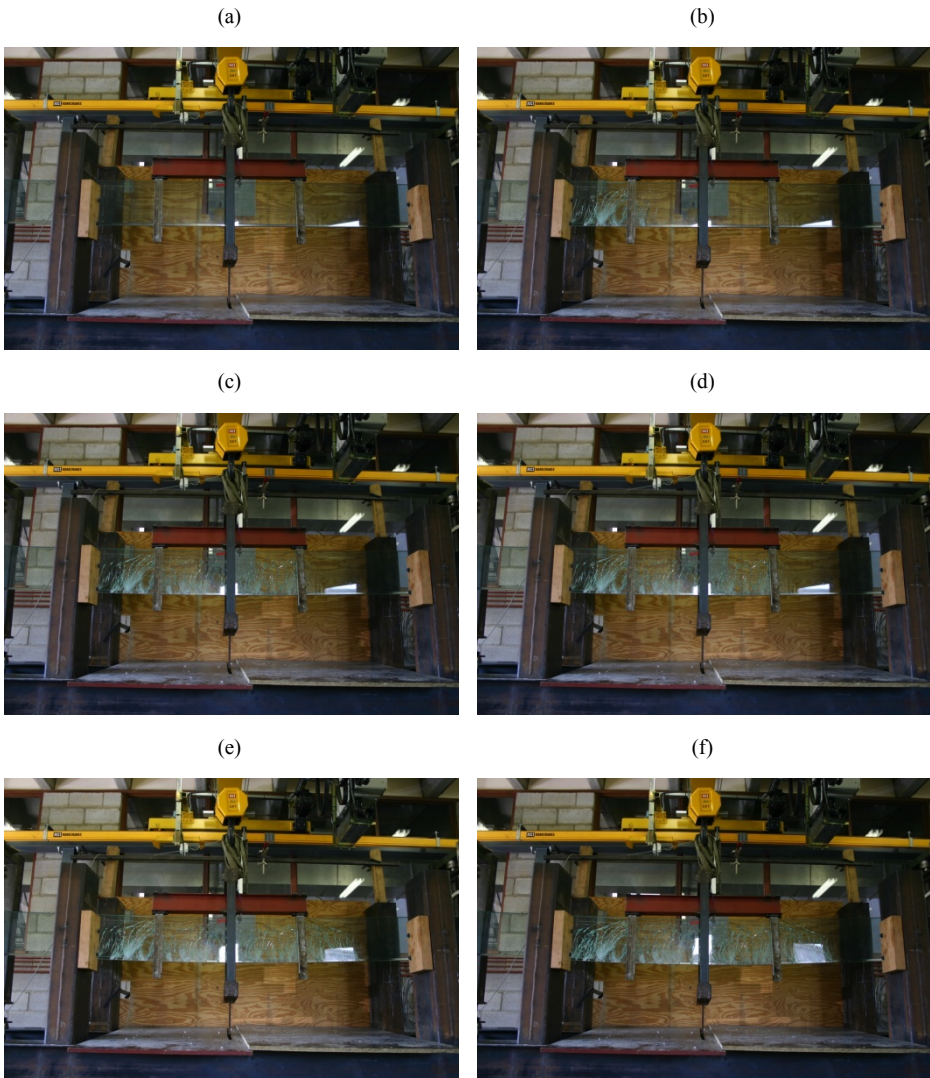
Photo sequence of an exemplary bending test on a 3.2 m SG-laminated reinforced glass beam, with hollow section reinforcement; lateral torsional buckling test.
